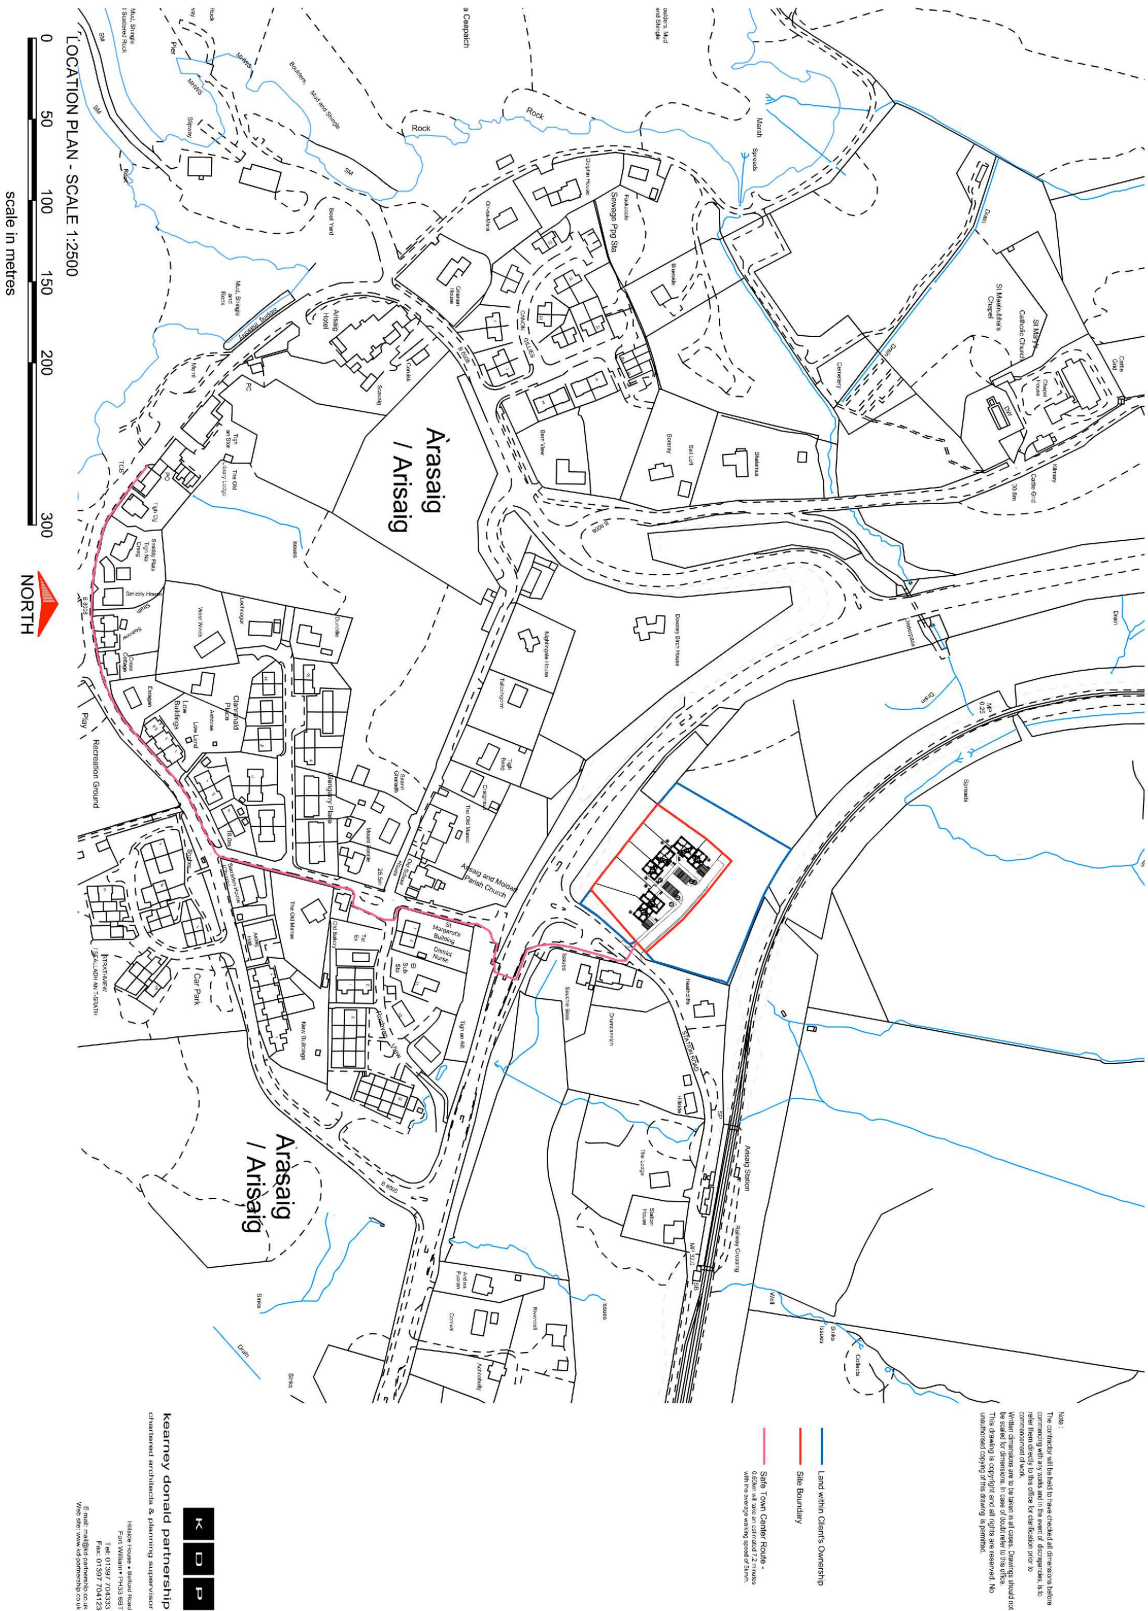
'Safe Walking Route' From Proposed Site to Village Centre
